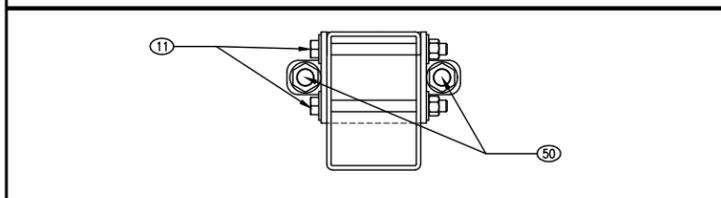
ENDWALL UPRIGHT TO CEE CHANNEL CONNECTION
